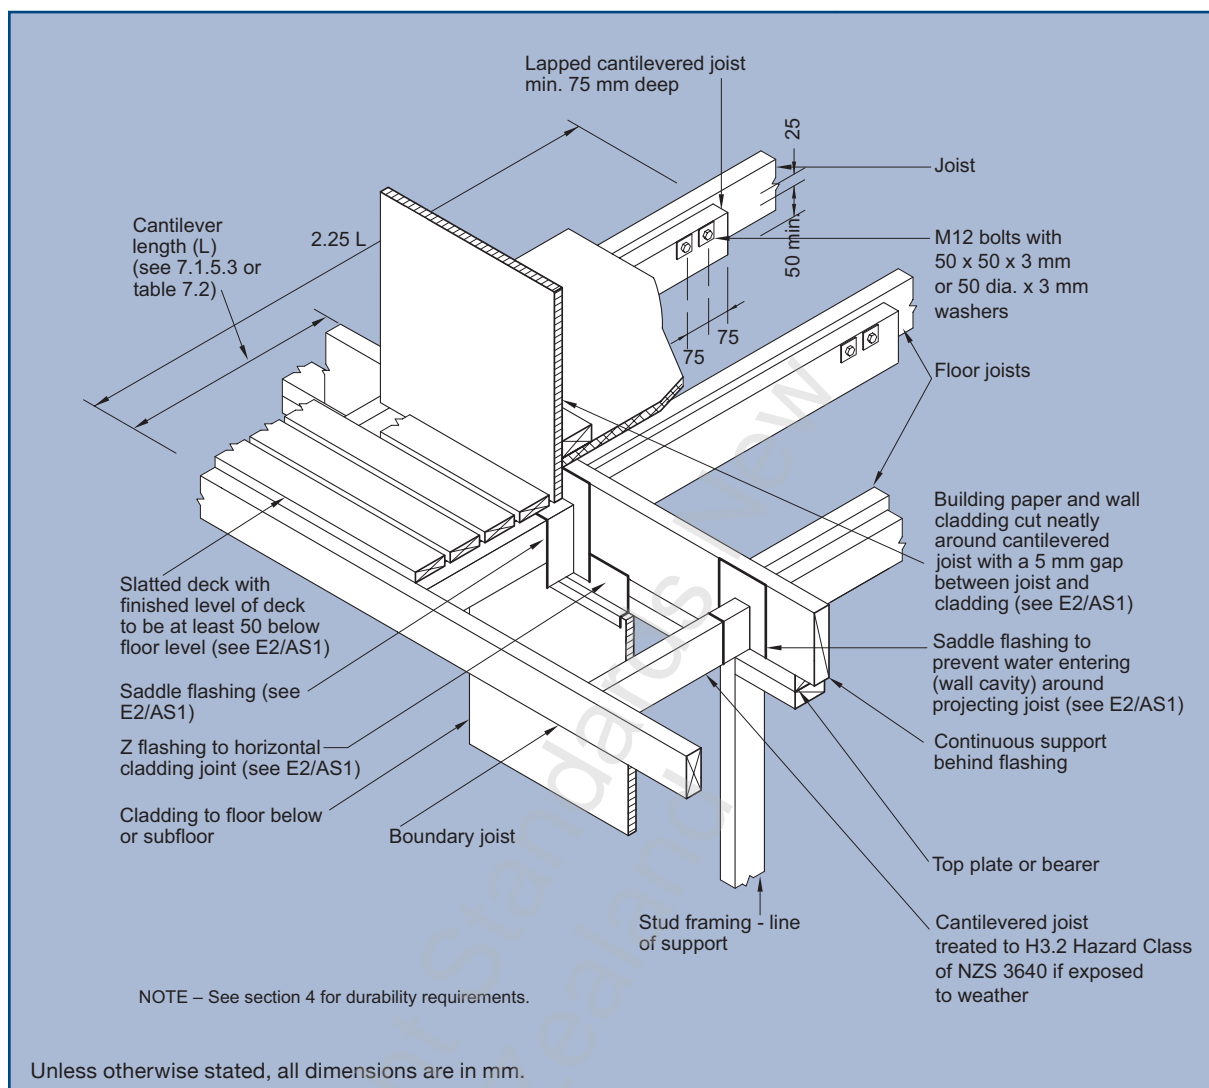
Lapped cantilevered joists (stepped/notched) (see 7.1.5.3)
